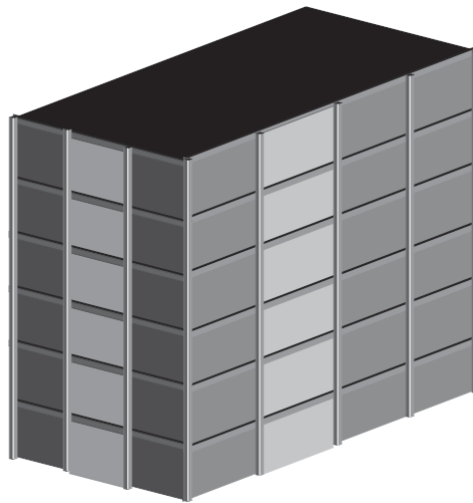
Axonometric view of the layout of structural walls added to frames in model “Gregor”
